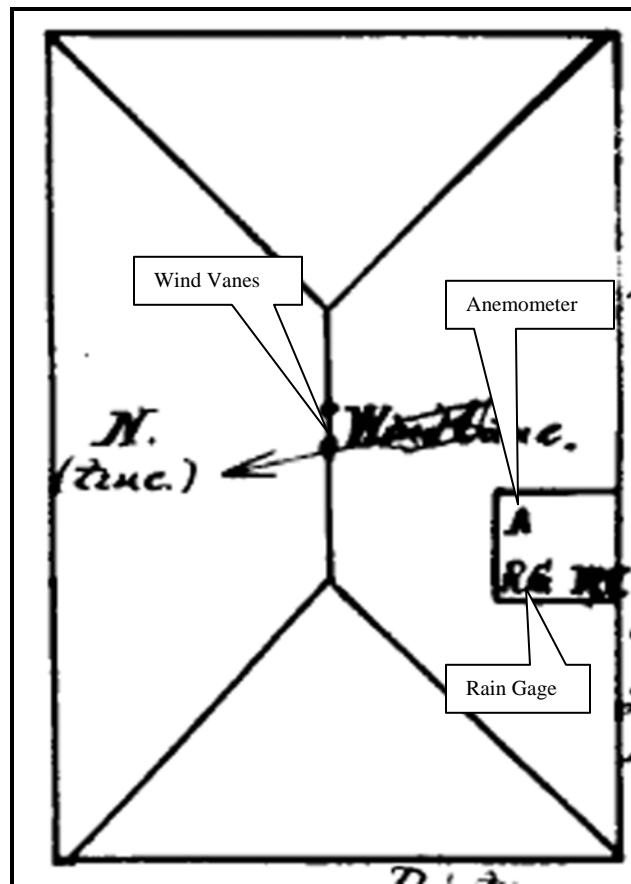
Roof of the Hunt Building showing the locations of the rain gage and wind instruments (17-20 August 1872). North is to the left side of the figure. The rain gage and wind instruments were located on the roof of a small shelter (six feet high, five feet wide, and five feet long) that was over a trap door on the roof. The roof was made of sheet metal and peaked at the center. From the National Archives and Records Administration.
